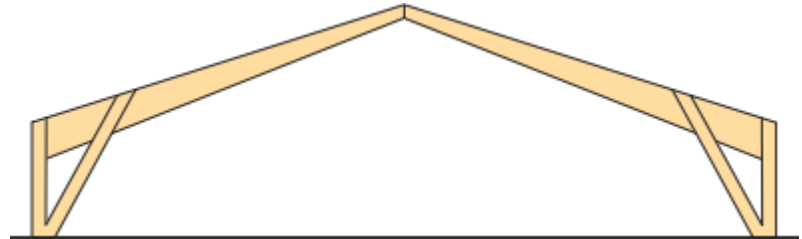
Three-pin trusses with tie on columns 15 – 50 m
